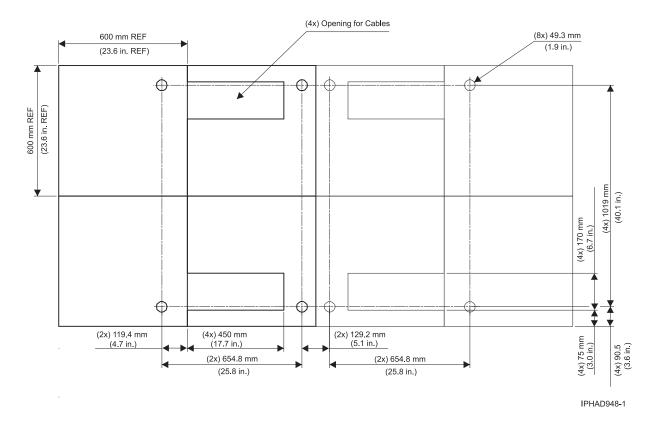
Eyebolt positioning for 600 mm (23.6 in.) floor tile layout
